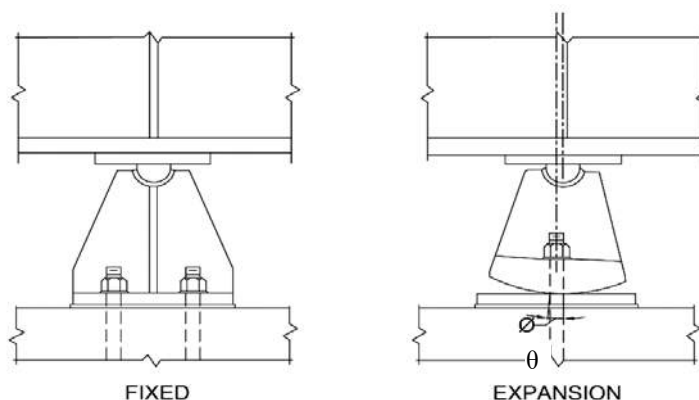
Steel Fixed Bolster and Steel Rocker Bearings
